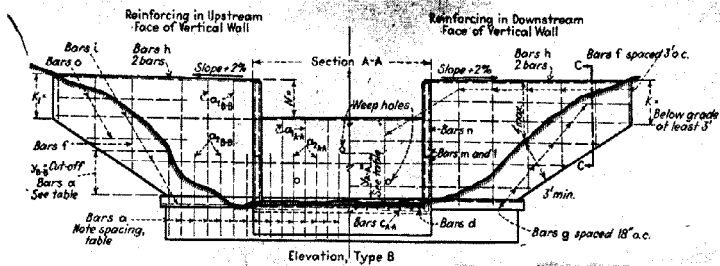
REINFORCED CONCRETE WEIR NOTCH DAM
